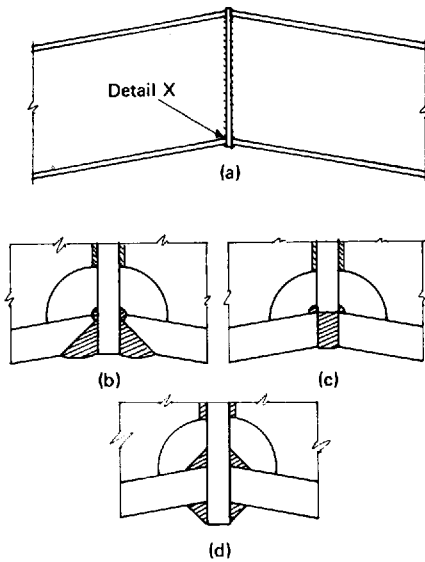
Welded apex connections. (a) General arrangement; (b)–(d) different approaches to the tension flange connection
